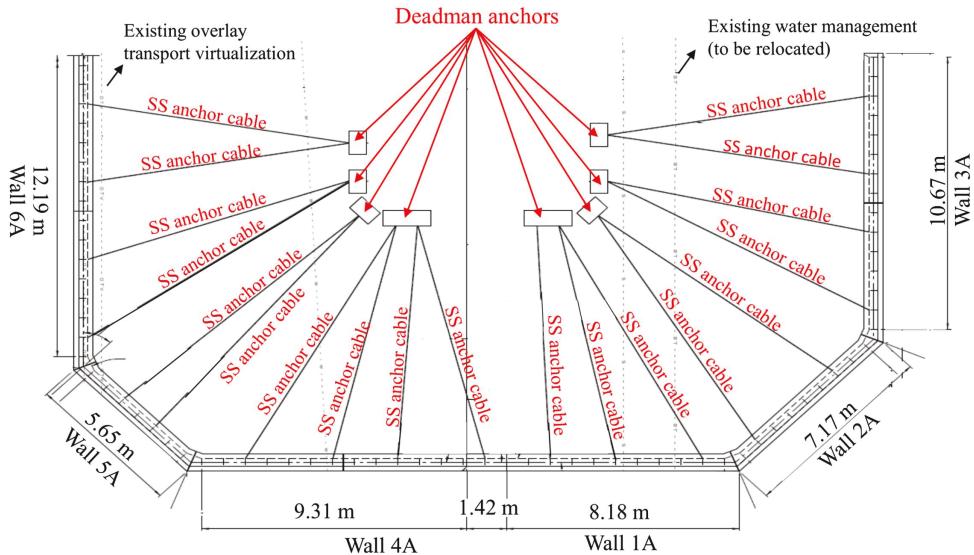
Tie-back sheet pile wall design plan view (FDOT Bridge plans).
